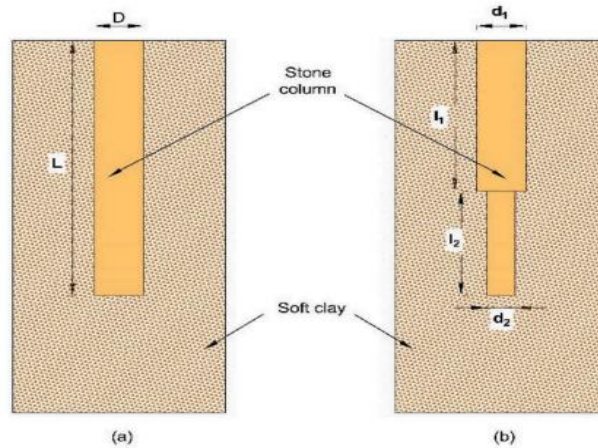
Geometry of stone column (Source: Hamzh et al., 2019)
